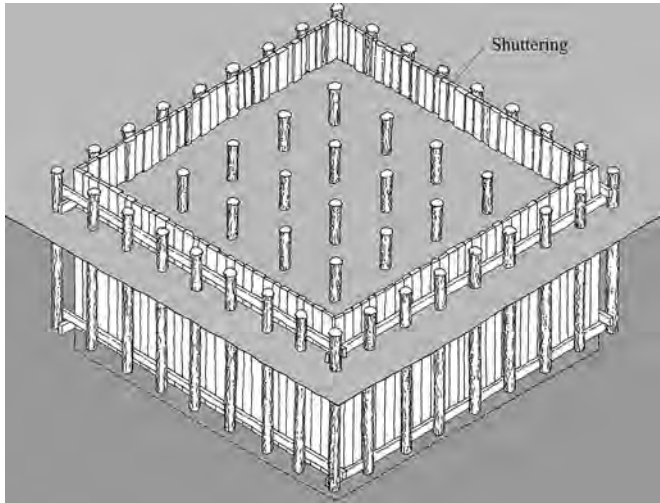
Reconstruction of vertical timber board shuttering fixed to the upper horizontal rail installed in the fourth phase in building a Category 1 form (C. J. Brandon).
